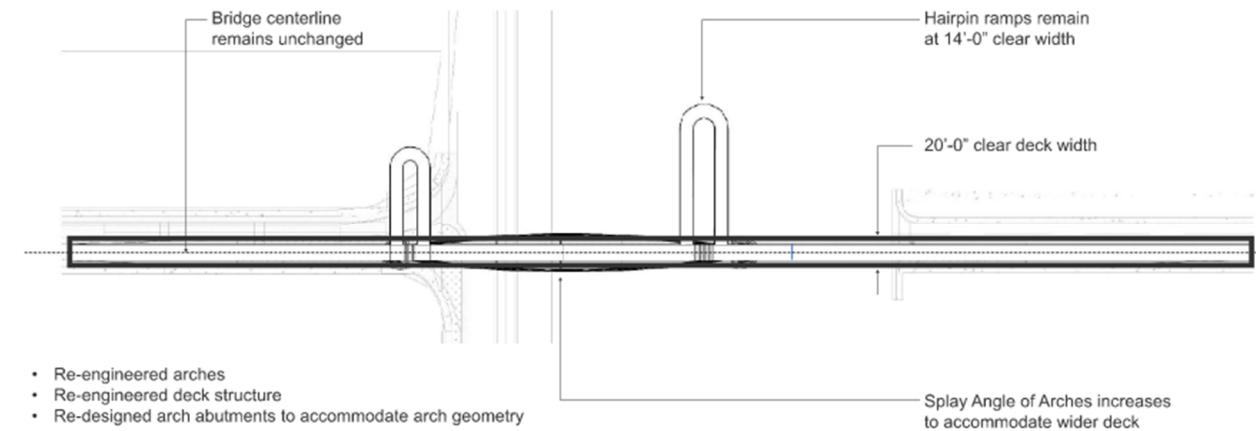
Hawthorne Avenue Concept 2B: 20-foot Deck Width
